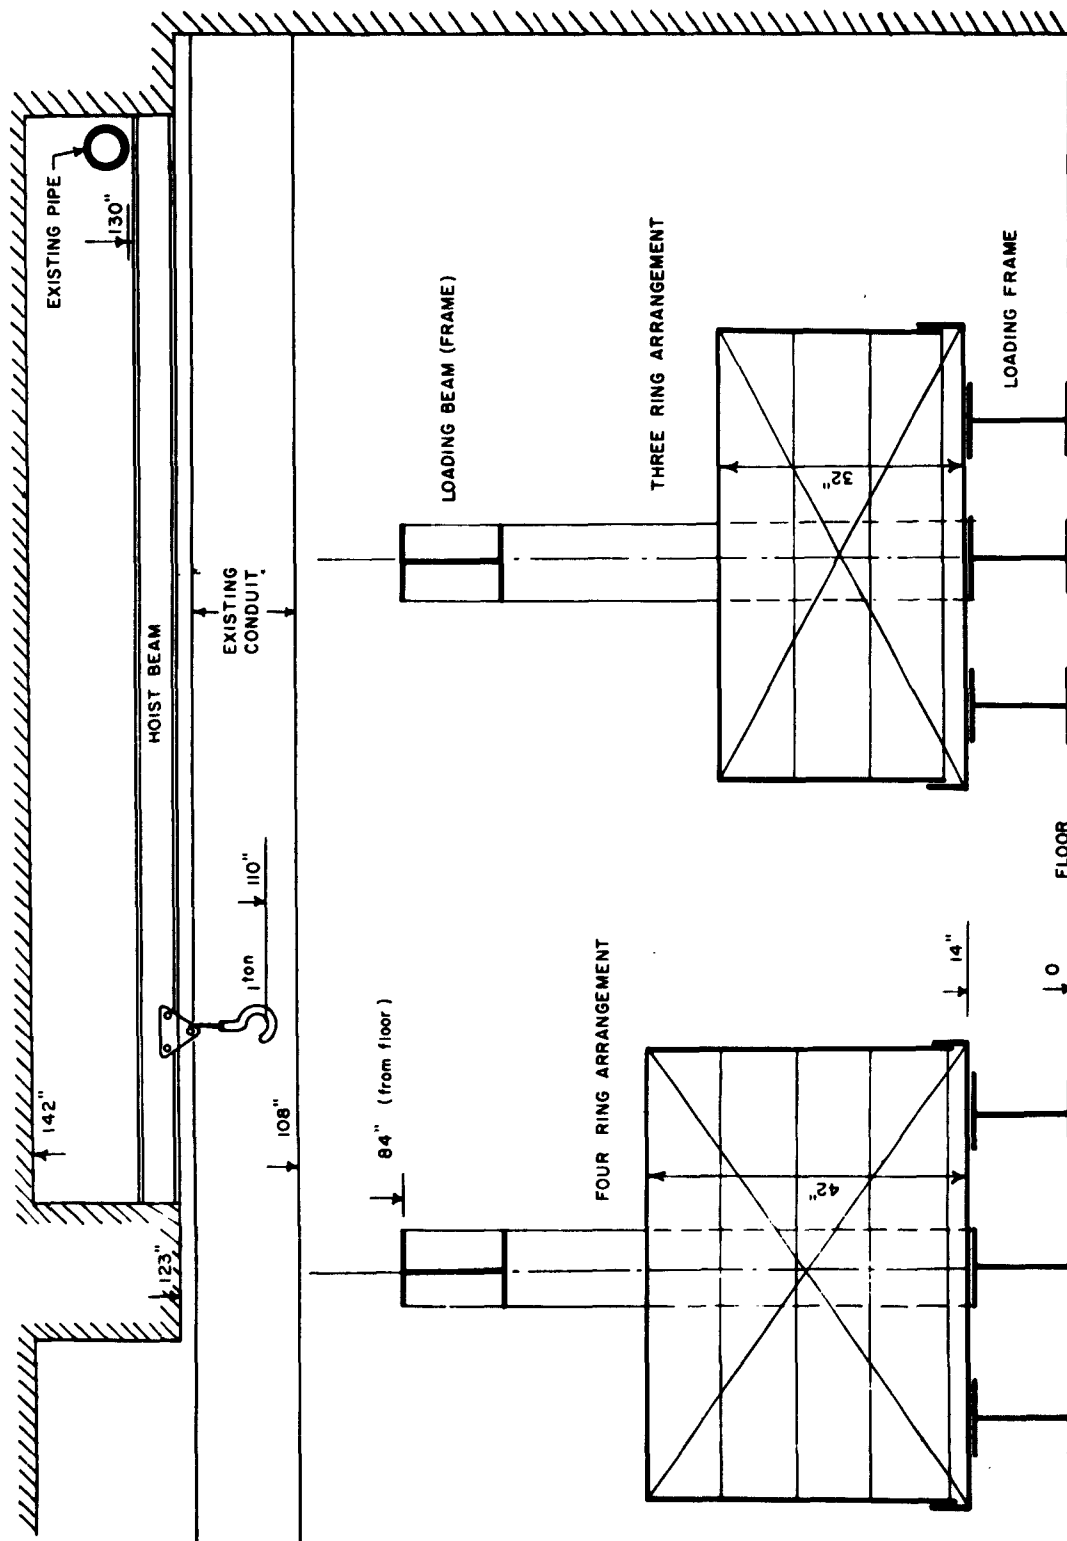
ROOM ARRANGEMENT, ELEVATION
